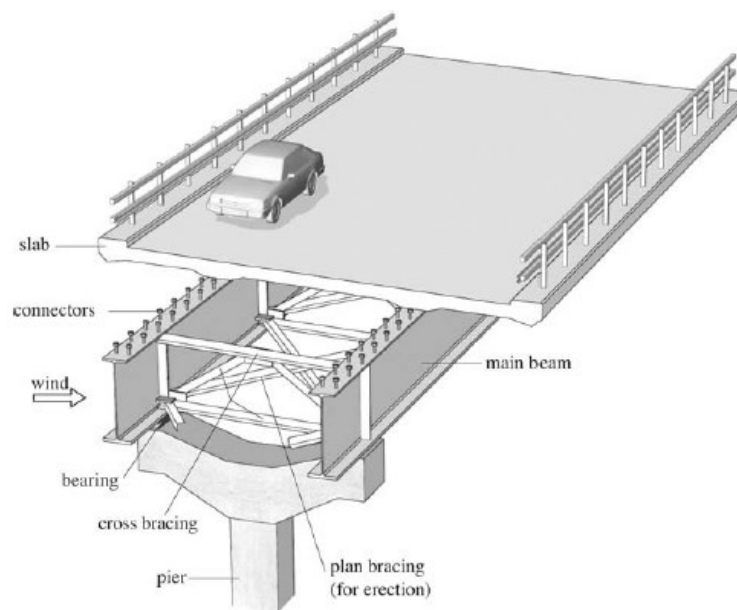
Schematic view of the structural elements of a composite twin girder bridge (Lebet & Hirt, 2013)
